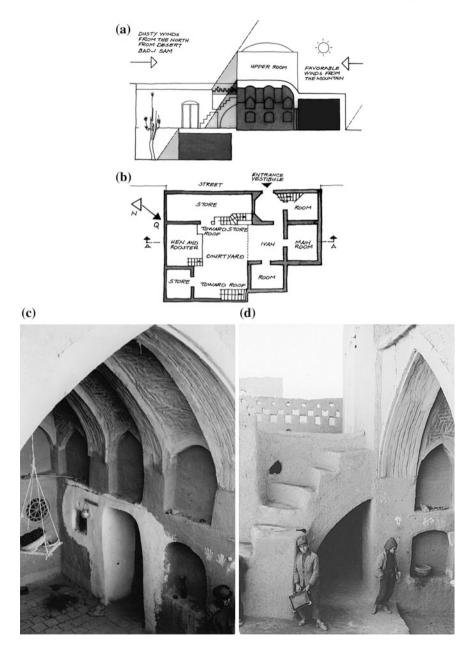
A rustic house type in Ardestan. Spatial arrangement in response to climatic factors: a Section. b Plan. c Ivan, back to the hot afternoon sun. d Steps toward the store roof
